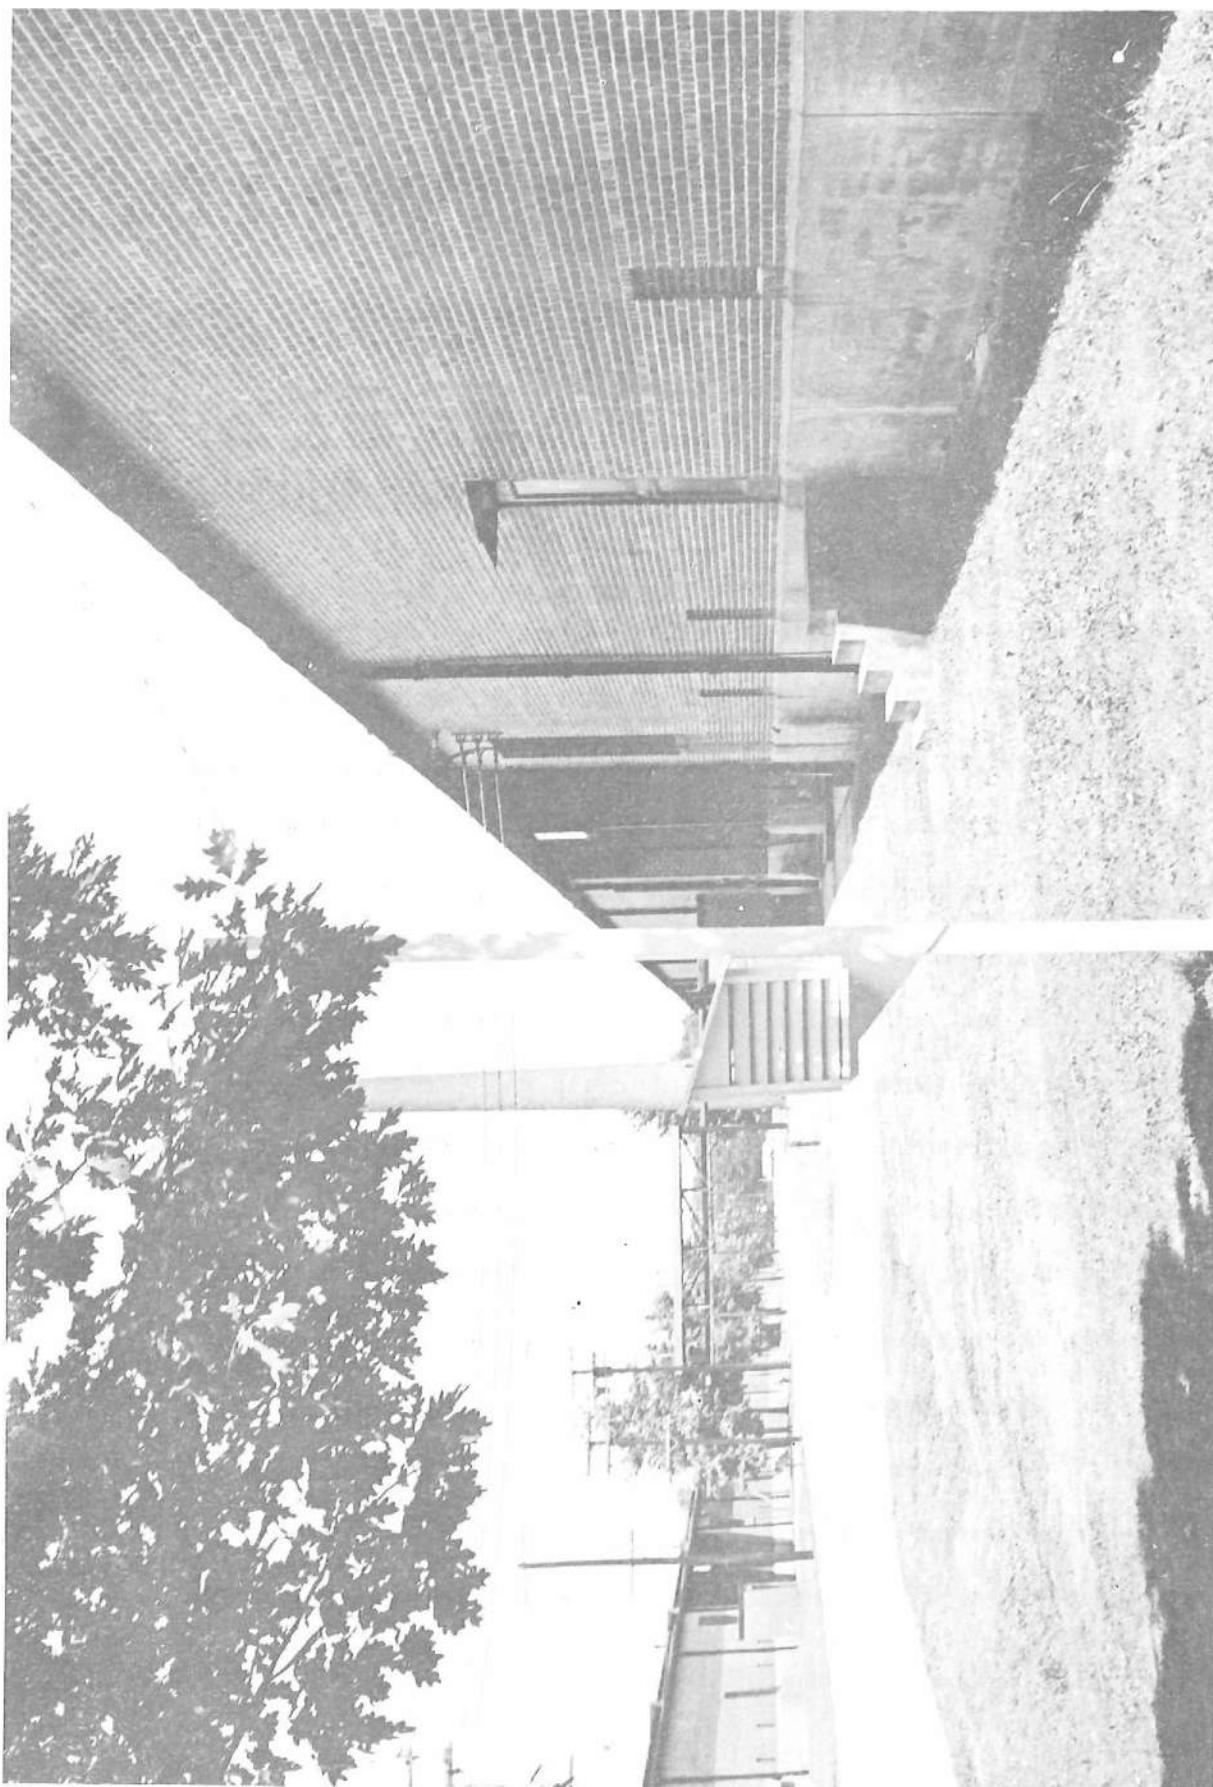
North side of warehouse showing ventilation louvres and weather shelter.
